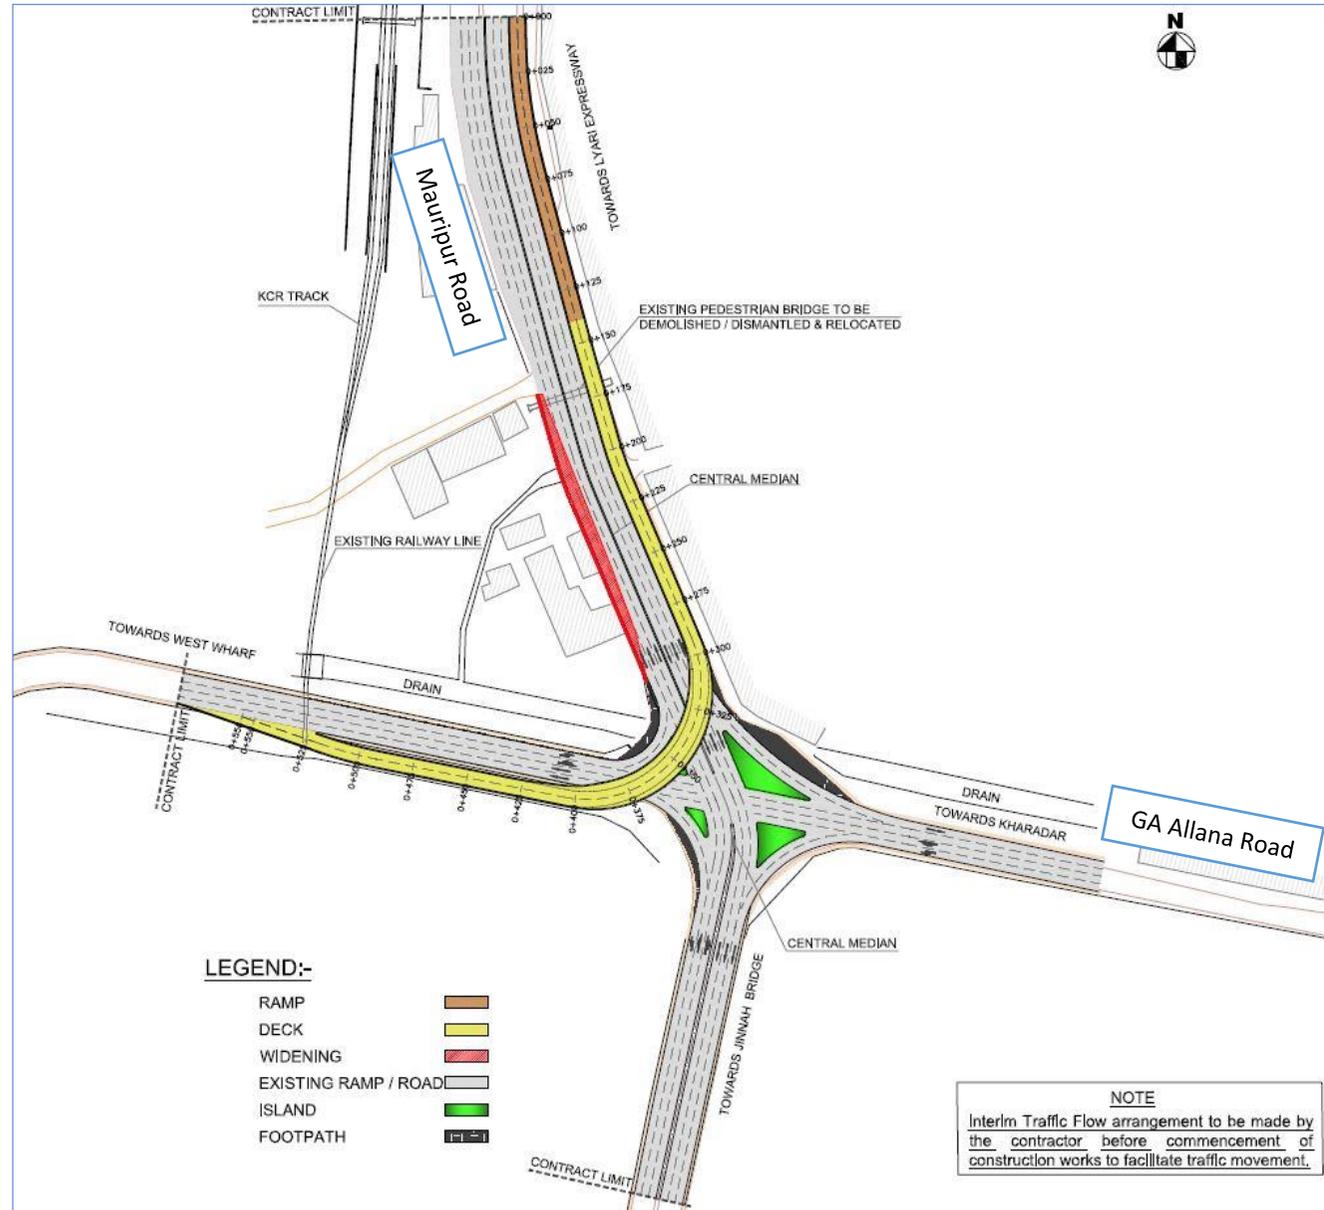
Proposed Intersection Improvement Plan (Short-term)
